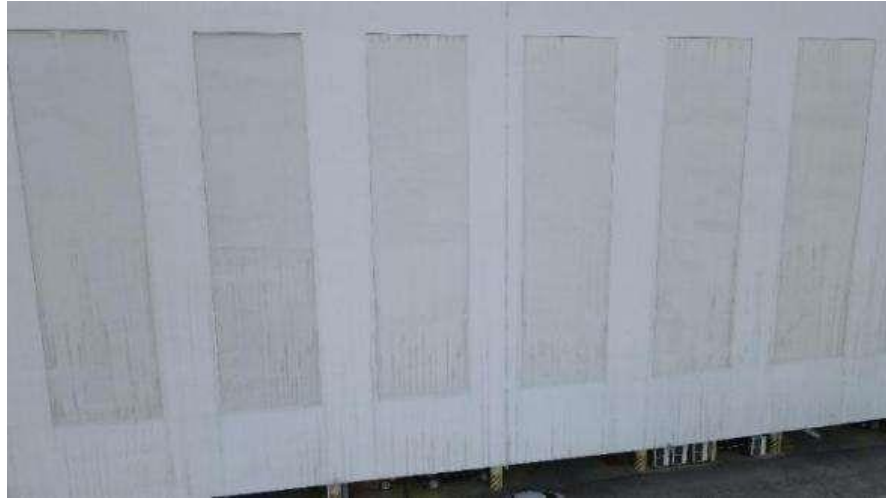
Cracks in the plaster layer of a lightweight insulation system
